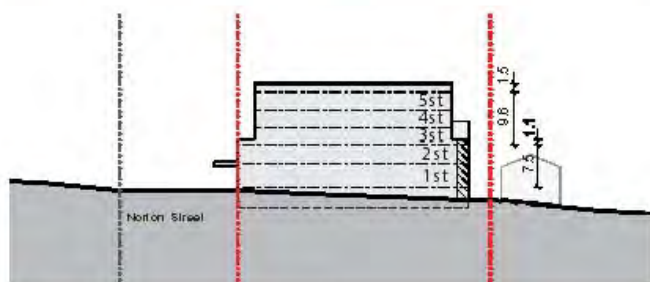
Carlisle Street - Building envelope - Section D-D
